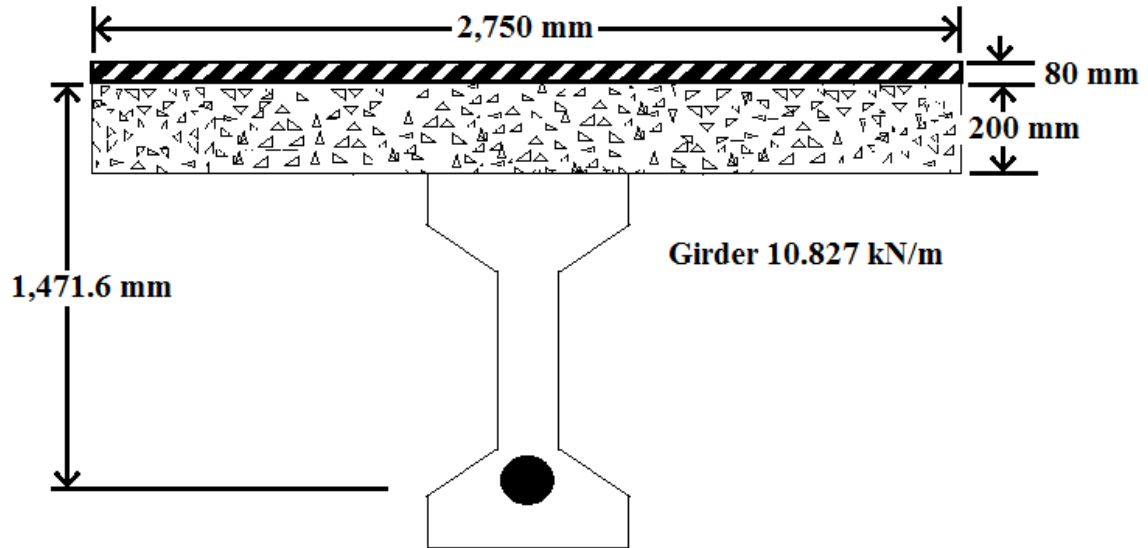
Cross section of interior girder at mid-span, 20 m CPCI Girder (x6)
